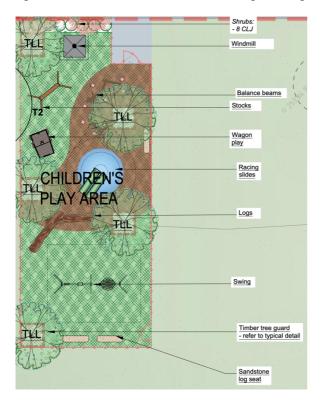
Extract from the landscape plans showing the detail of the children's play area
